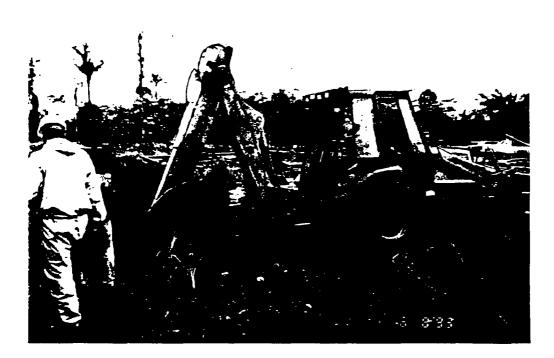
Backhoe used to excavate test pits at Shushufindi Field.
